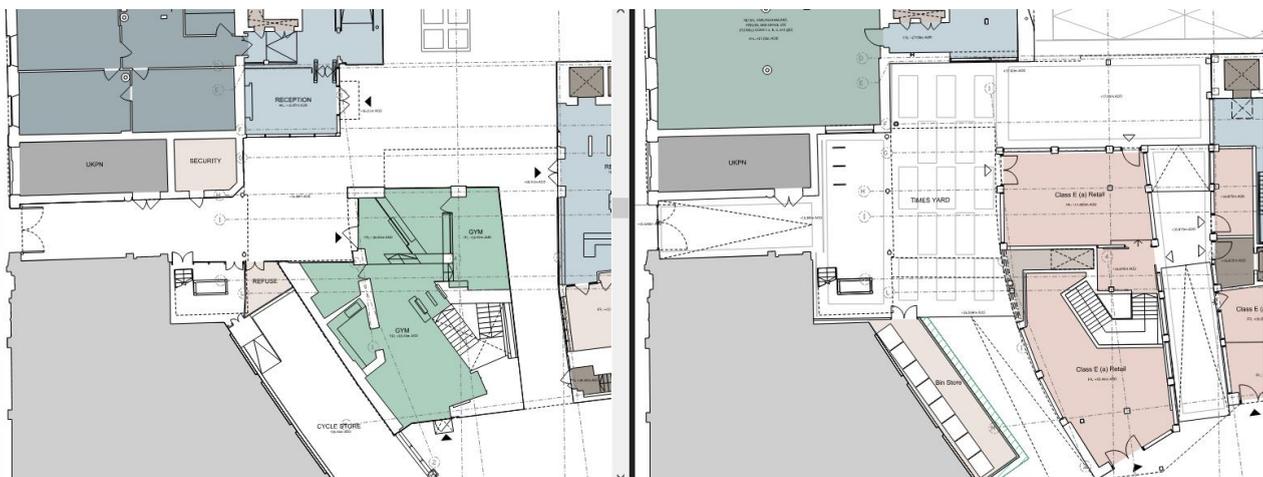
Existing and proposed ground floor layout changes to Times Yard
